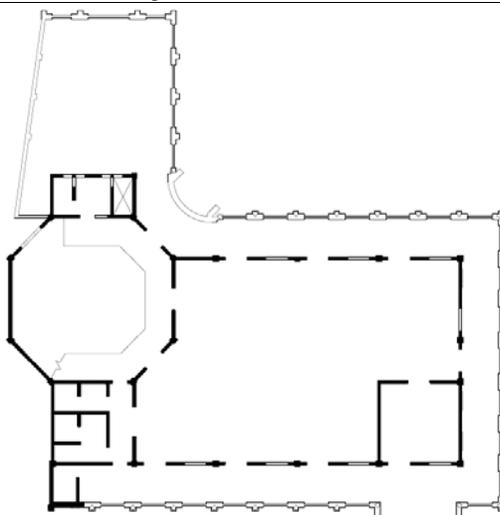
The sitemap of the 3rd floor of Jiwasraya Insurance office building. Source: private documentation.
